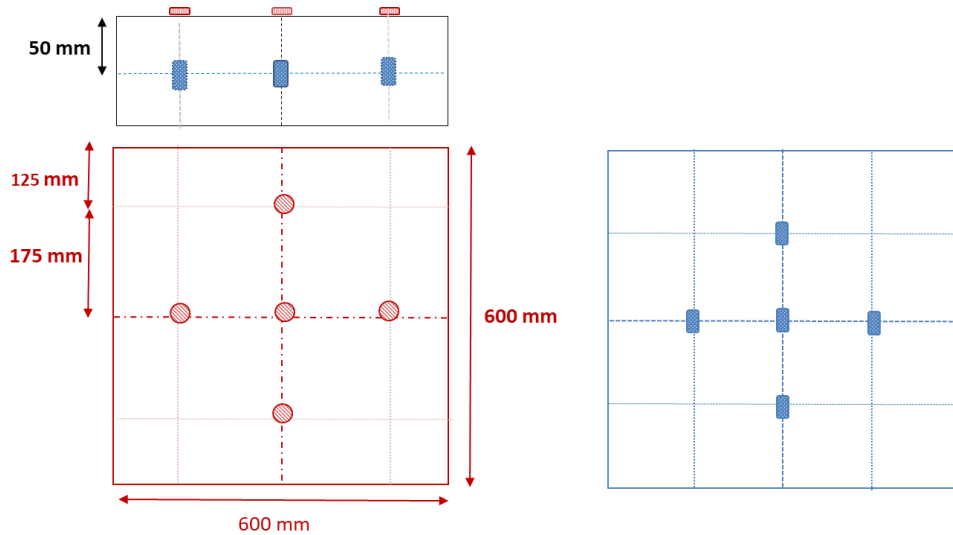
Elevations of concrete panel installed with the surface-mounted PZT patches and embedded PZT cement modules
